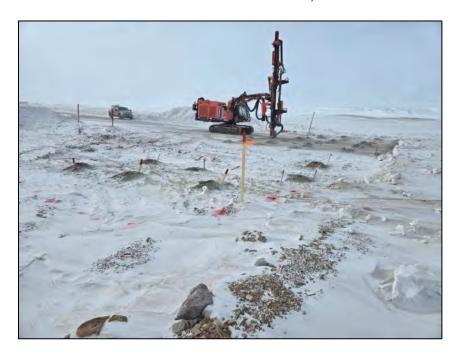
Prior to Construction - Vantage Point 1 - Upstream Side of Crossing - Looking Southwest (April 26, 2024).
